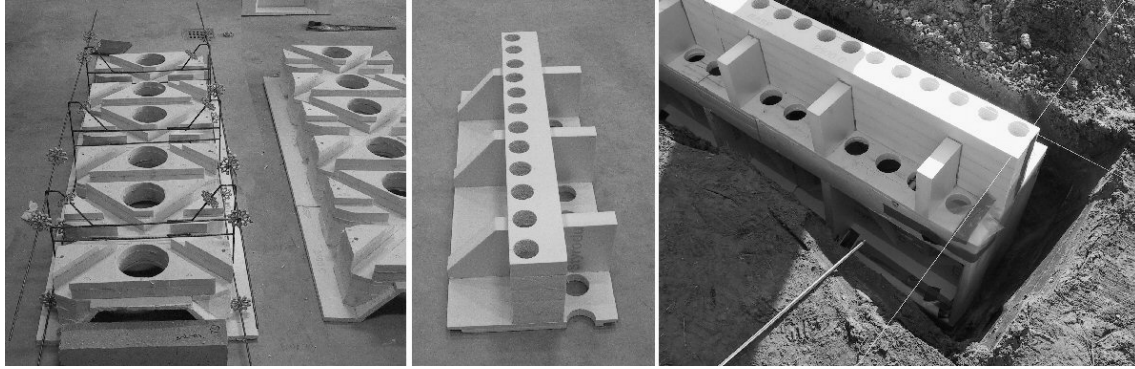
Detail of brickwork wall. 3D-shells, reinforcement and edge form are prefabricated. Concrete is poured on top of the floor and runs through openings of the EPS-edge form.
